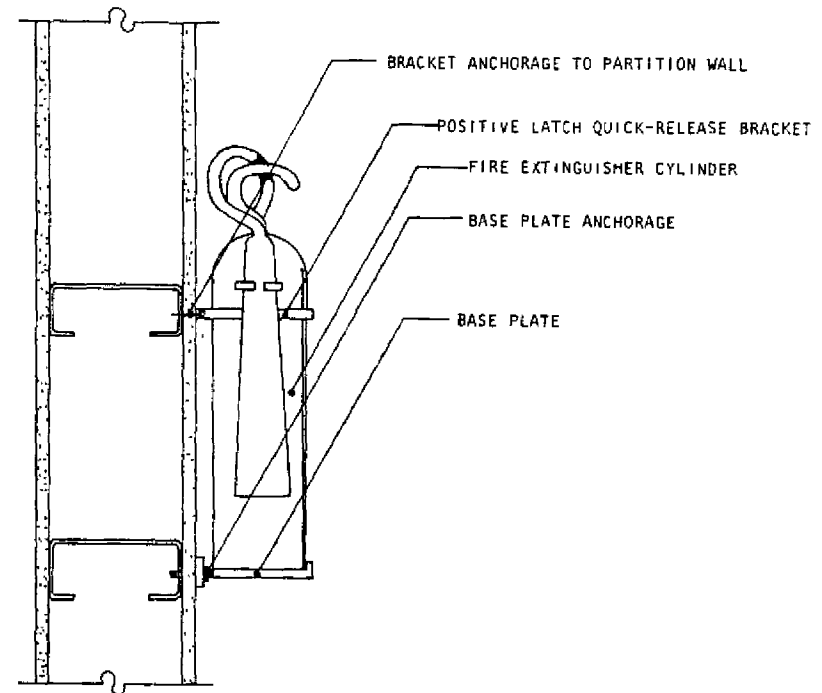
Fire protection systems Wall-hung fire extinguisher.
